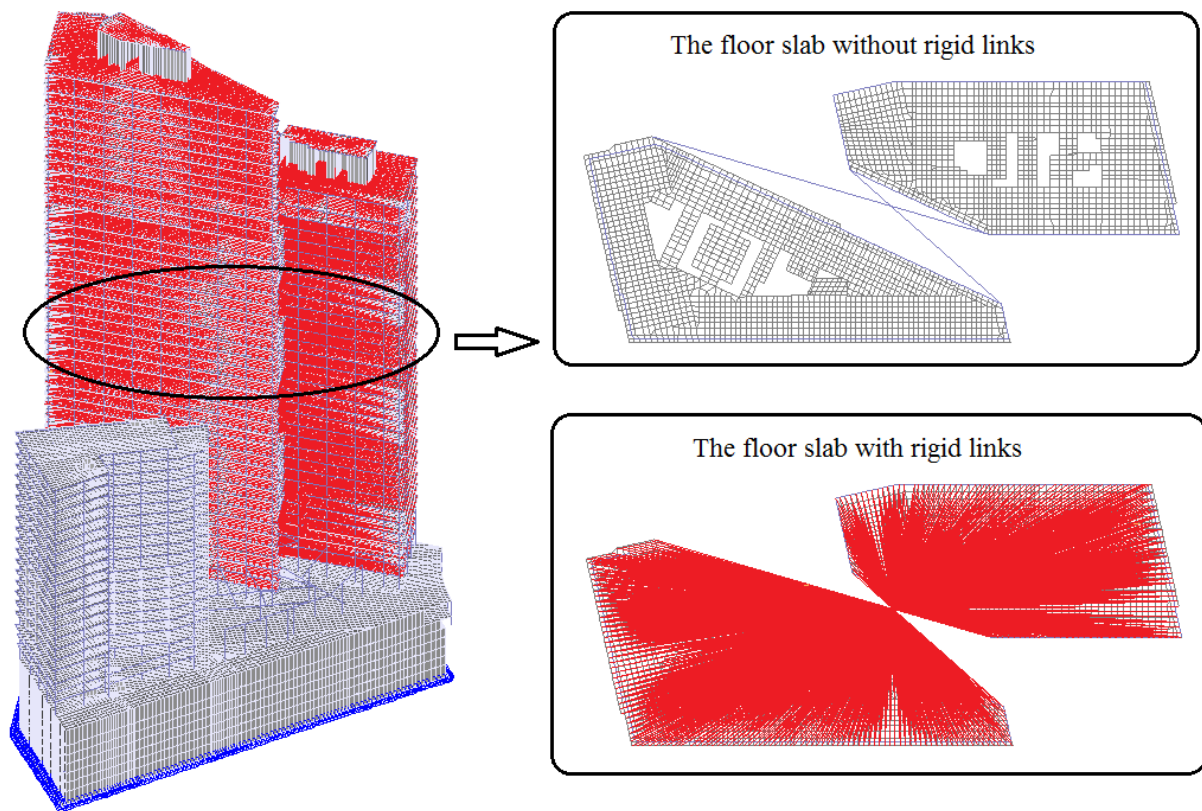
Design model of a high-rise building (1 275 162 equations) and a fragment of a floor slab. Rigid links are used for modeling floor slabs as a rigid body in the plane of the slab.
